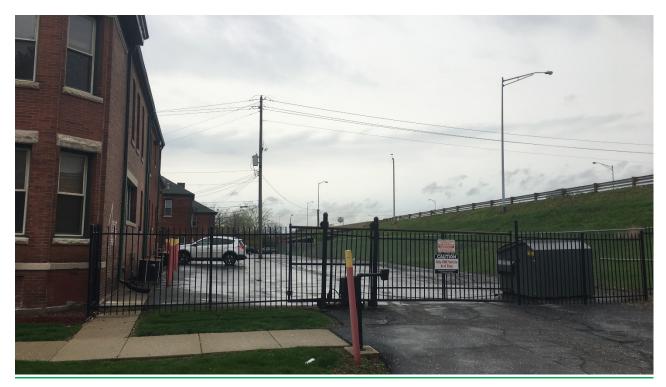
I-65 Embankment at New Jersey Street with Noise Barrier
